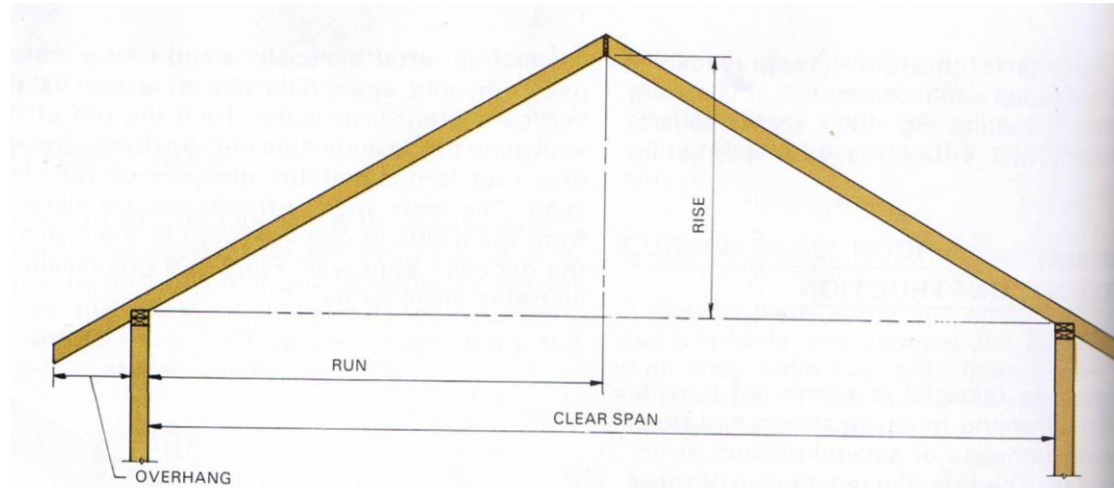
Graphic illustration of roof rise, run, and span.
